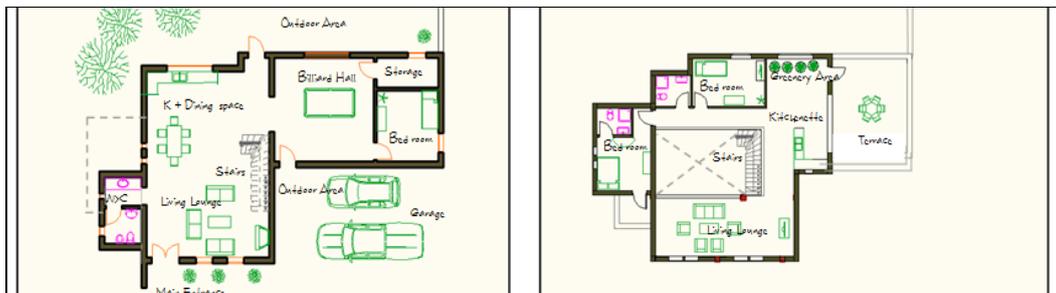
Ground and first floor plans for the first modification (Source: (By AutoCAD)).
